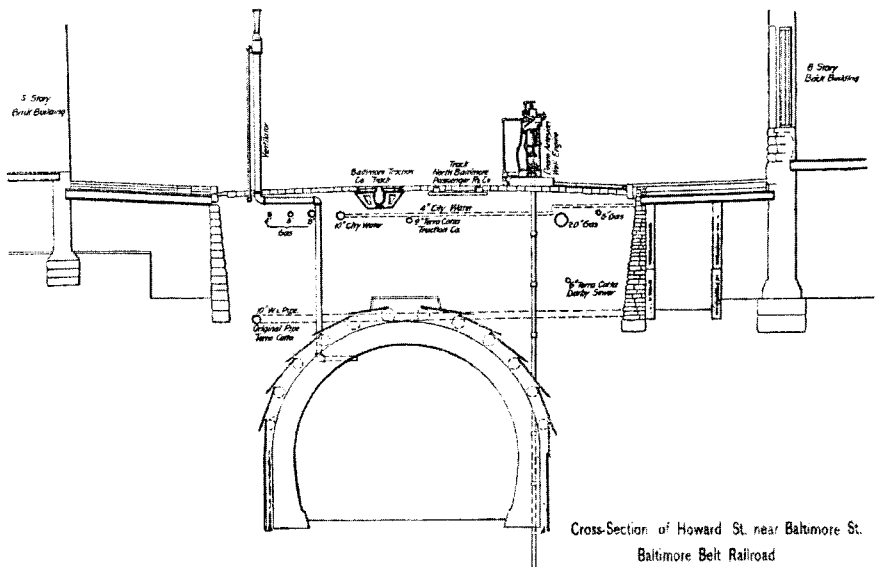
The relation of the tunnel to other Howard Street structures is clear in this drawing, which also shows one of the venturi-driven ventilators used during construction. (Engineering News)
